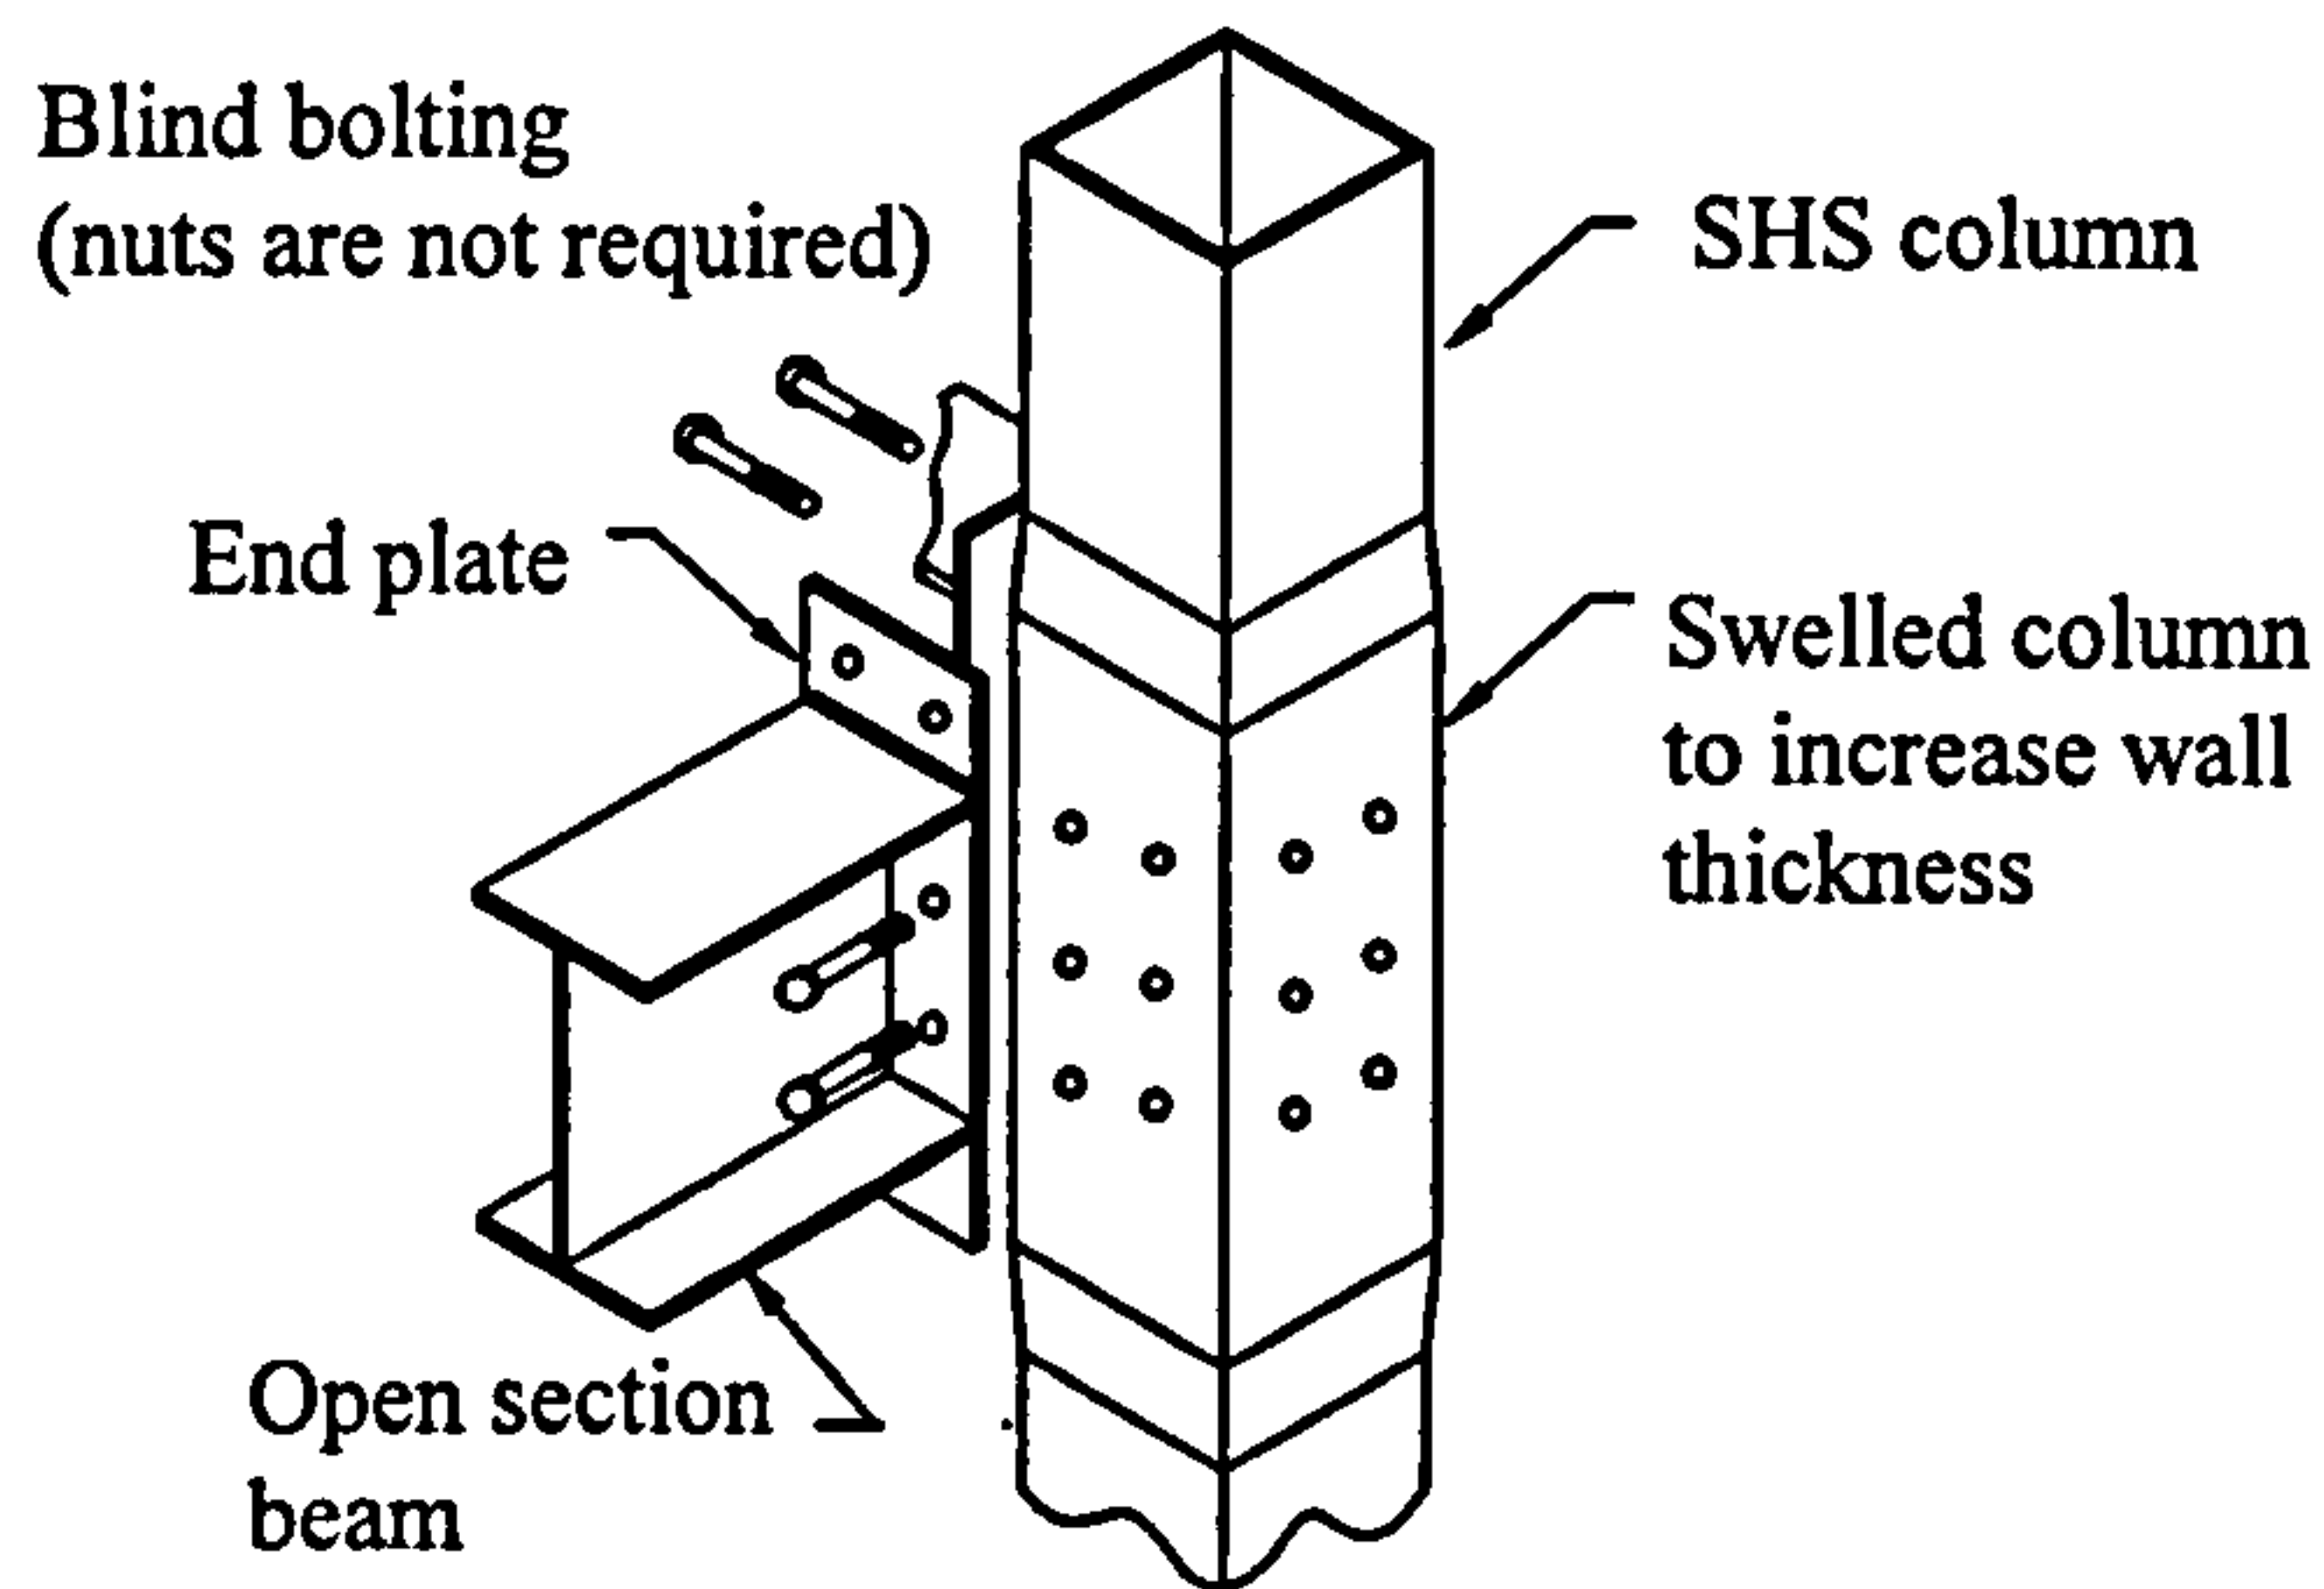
Typical structural system of multi-storey frames with open section beams and SHS columns
